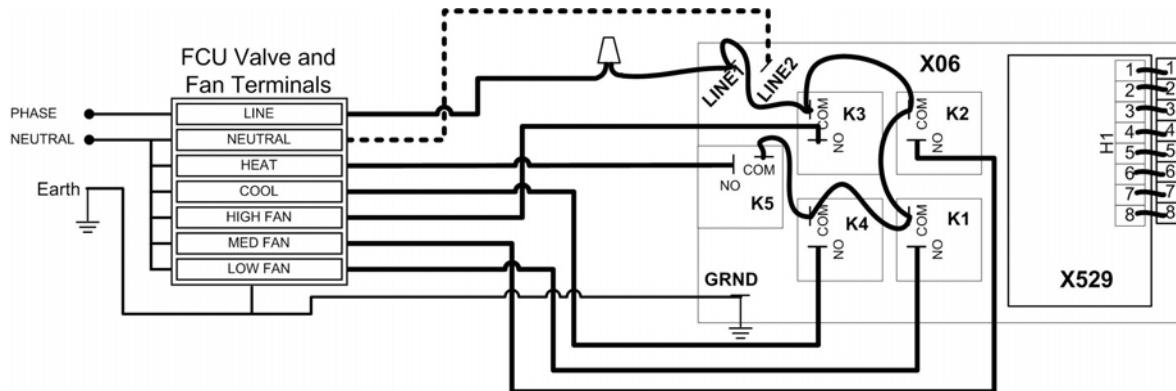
X529/X06 Connected to 3-Fan Heat/Cool FCU
